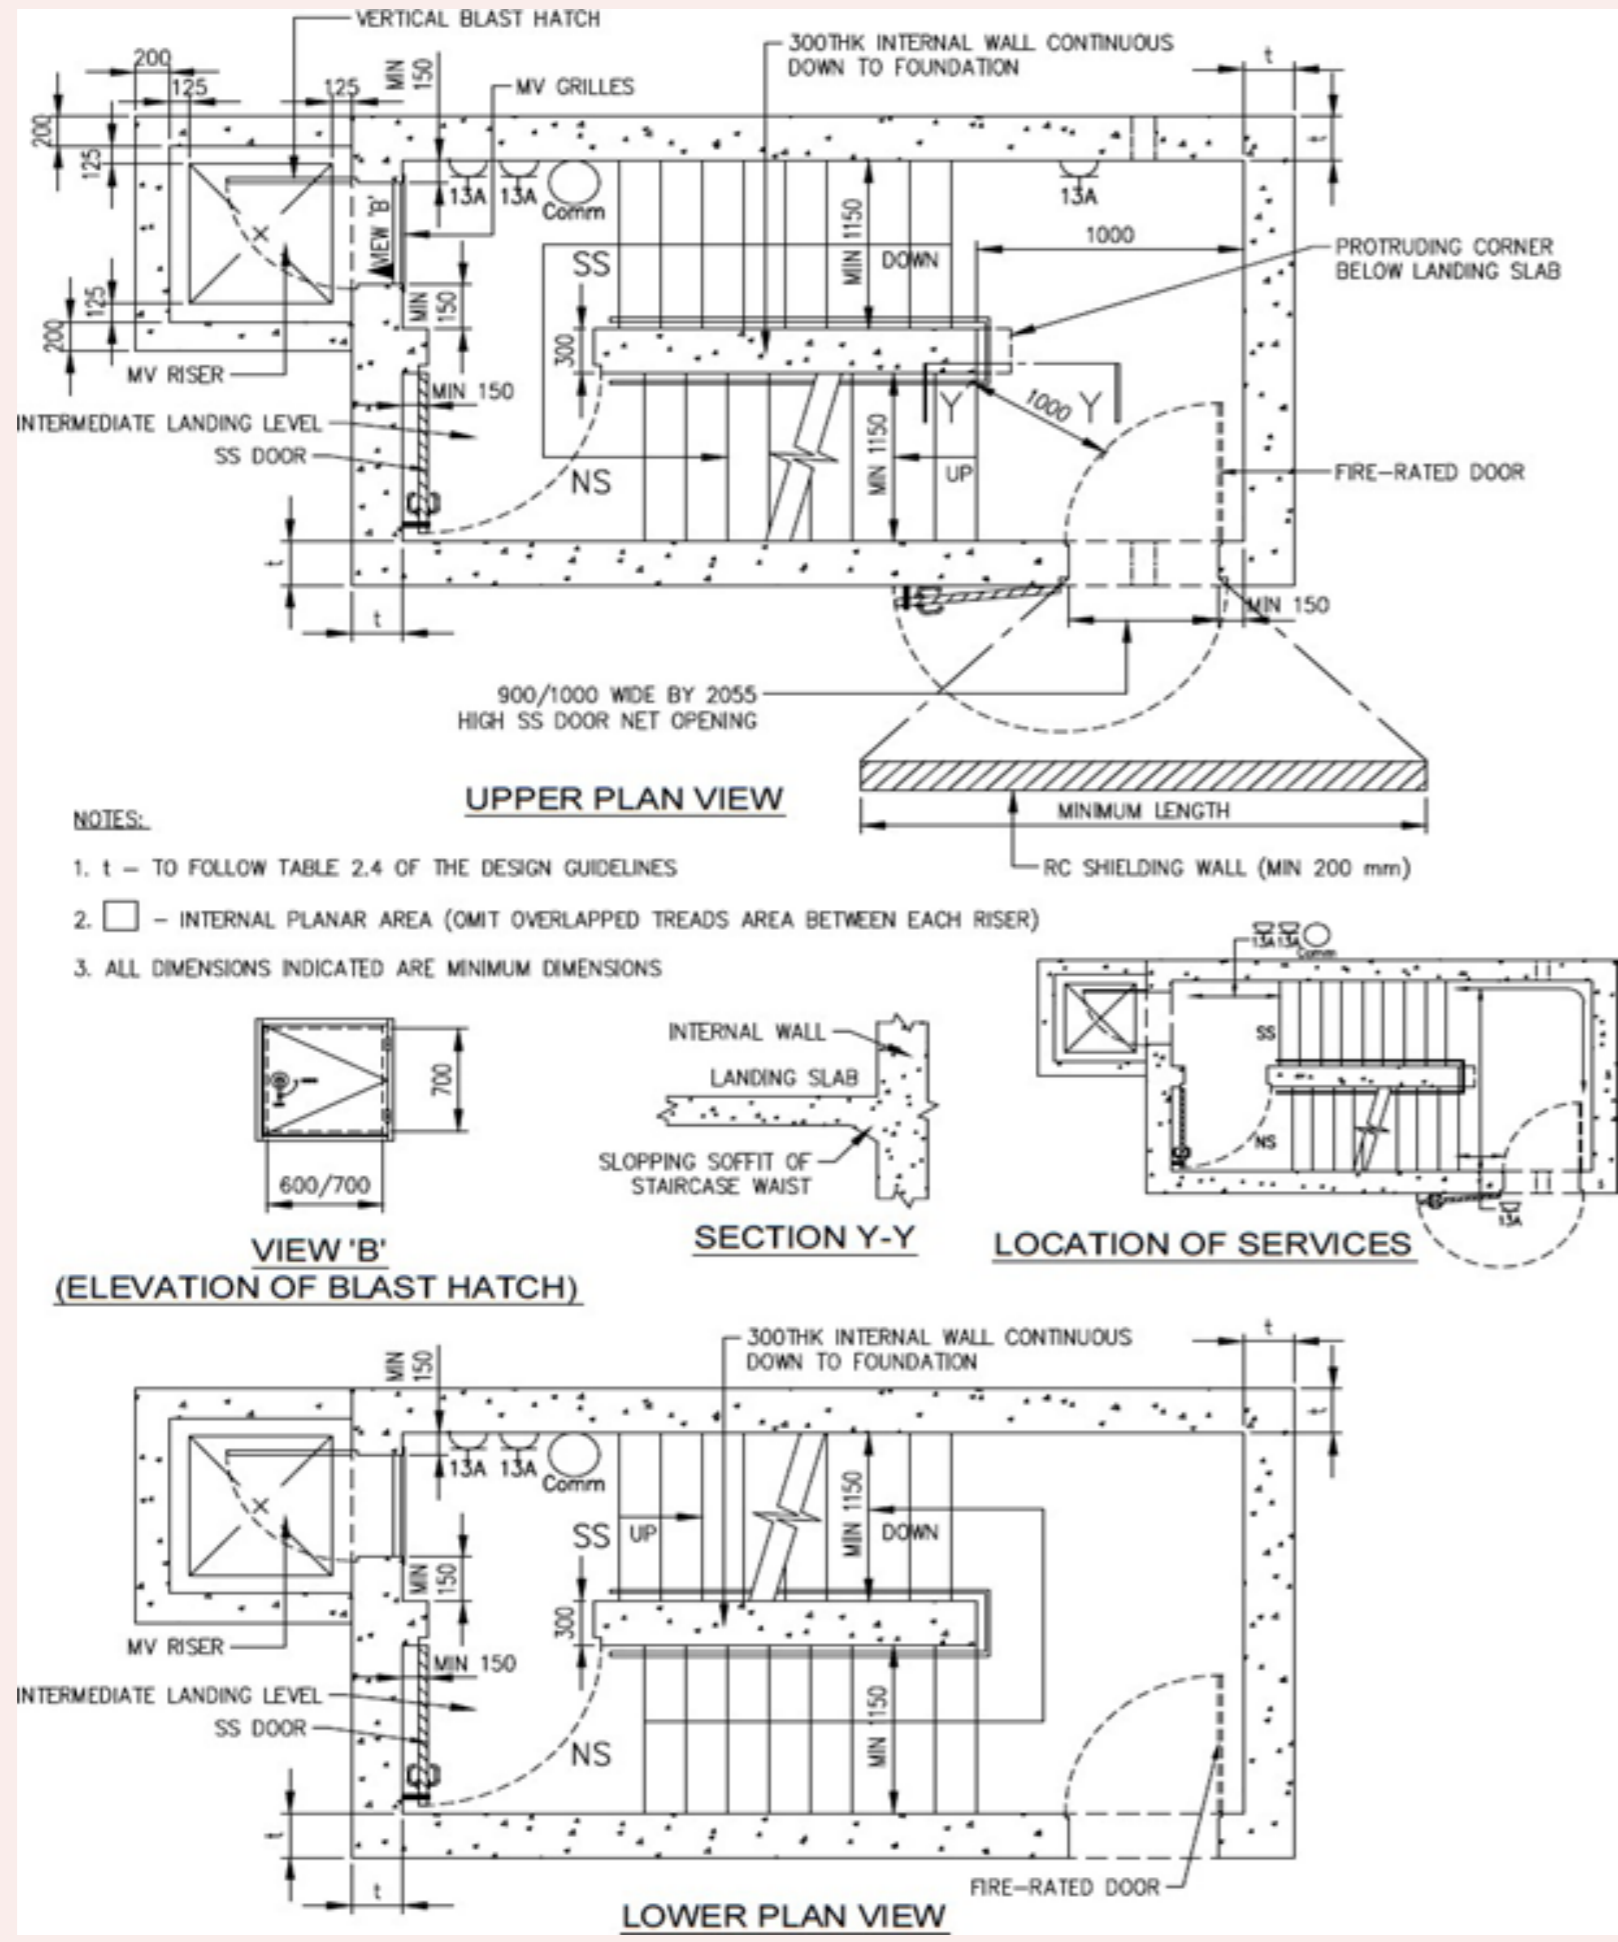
(j): SCISSOR S/C SS COMPARTMENT PLAN
